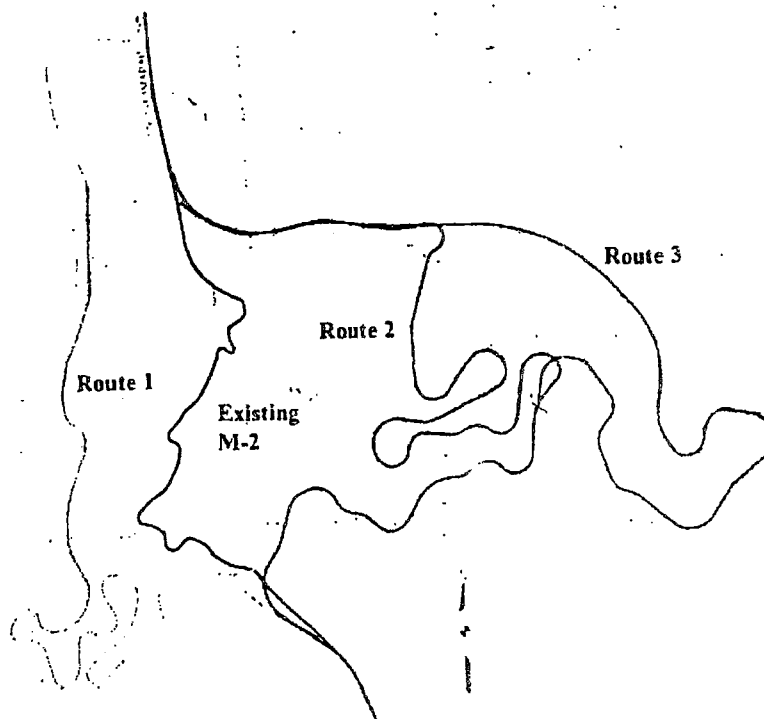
Alternative Route Realignment Plan in the Existing F/S
